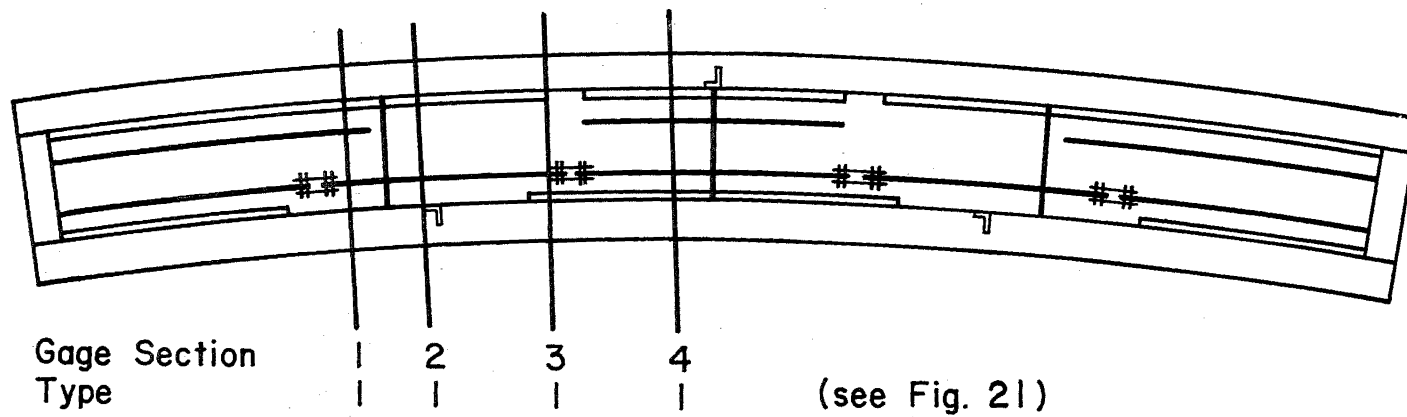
Plan of Box Girder Instrumentation - Girder 1
